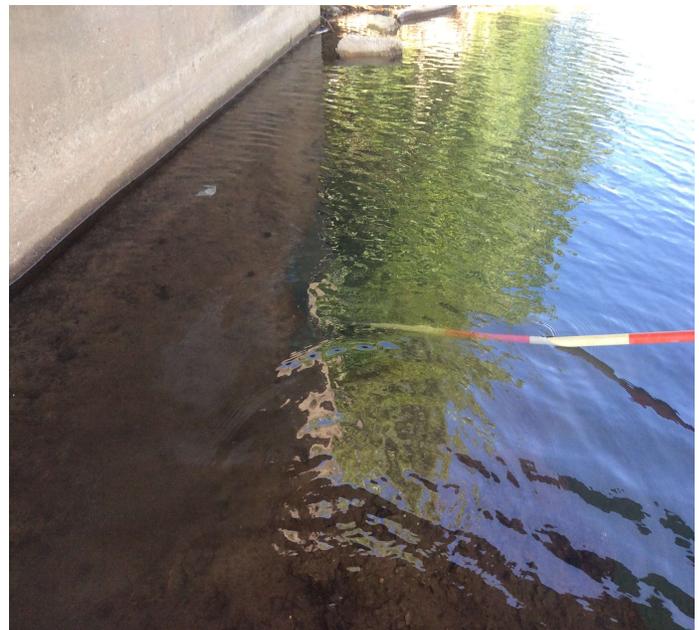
Description Abutment 1 undermining at irregular footing in breast wall
